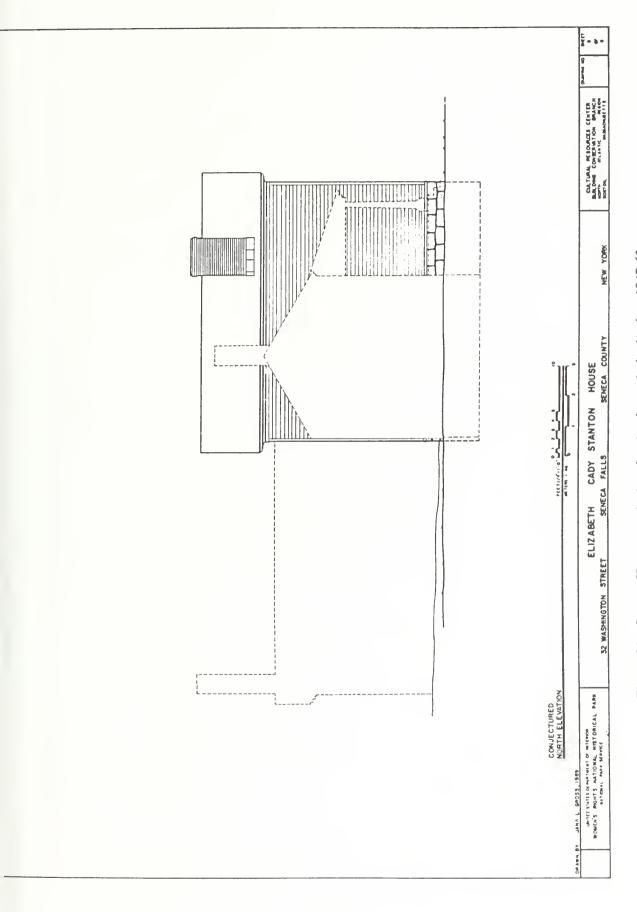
Stanton House: north elevation (conjectural view), circa 1847-62.
